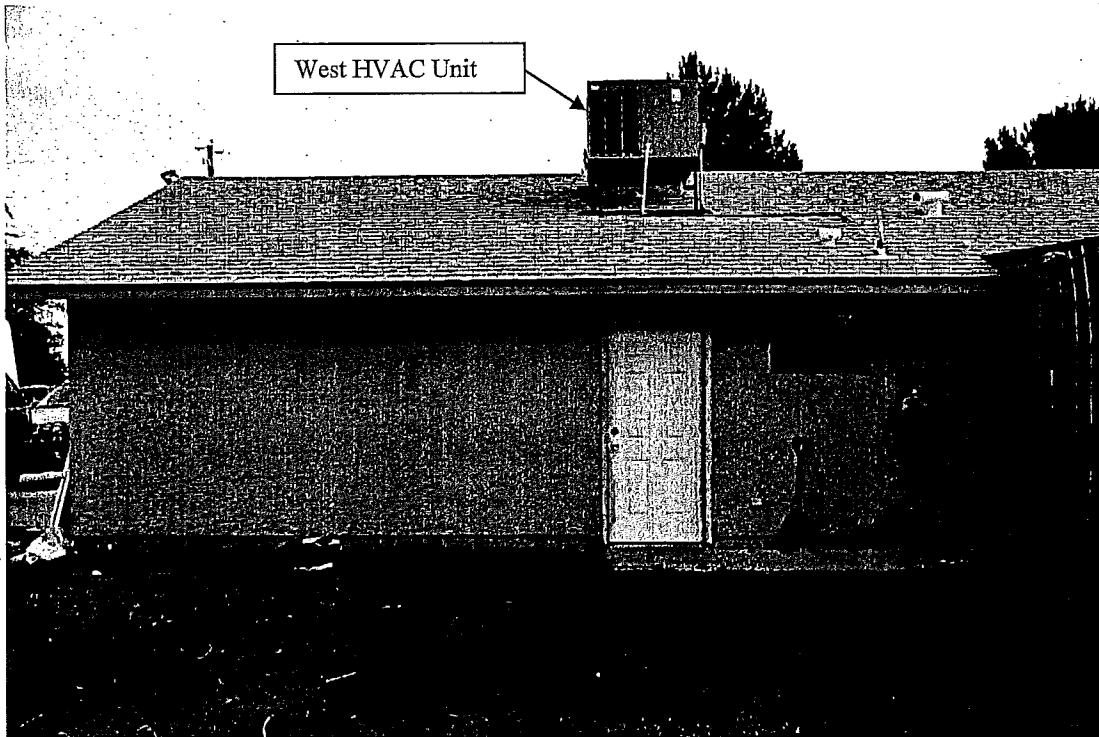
South entrance into room where dogs were found. Note west HVAC unit on roof above door.
